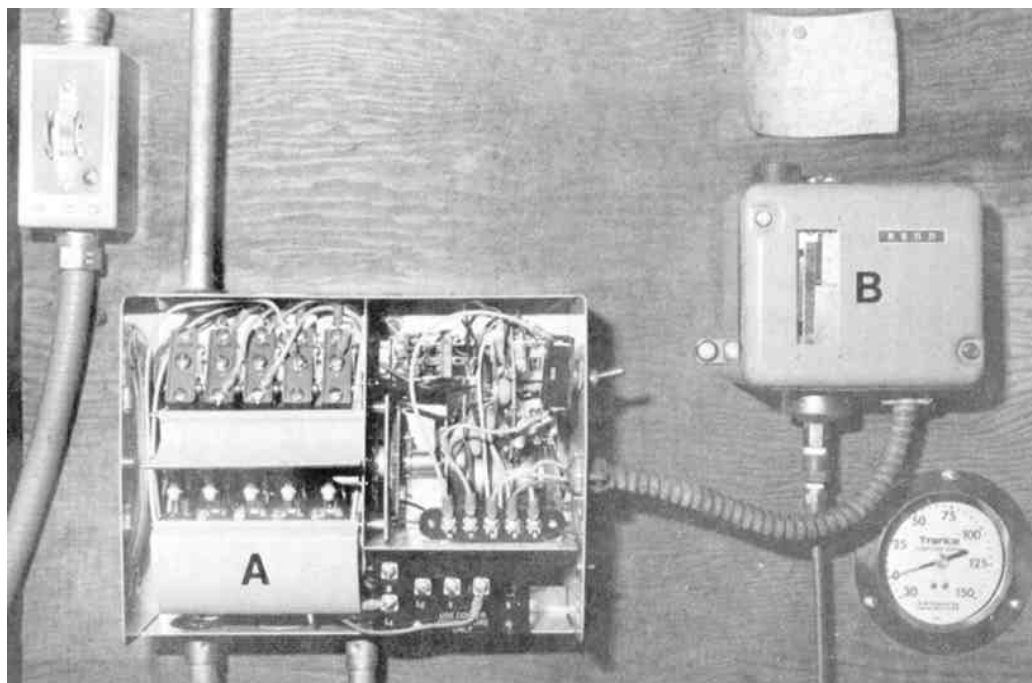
Step controller and pressure-sensor configuration. (A) Step controller with modulating motor, single-pole double-throw mini switches, and mouse trap relay assembly; (B) Pressure sensor that controls the step controller.
